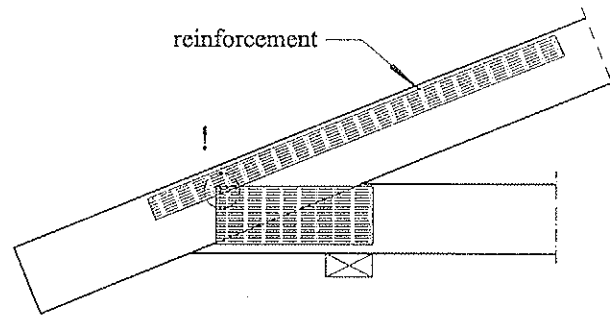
A reinforcement plate in conflict with a beam connecting plate.
